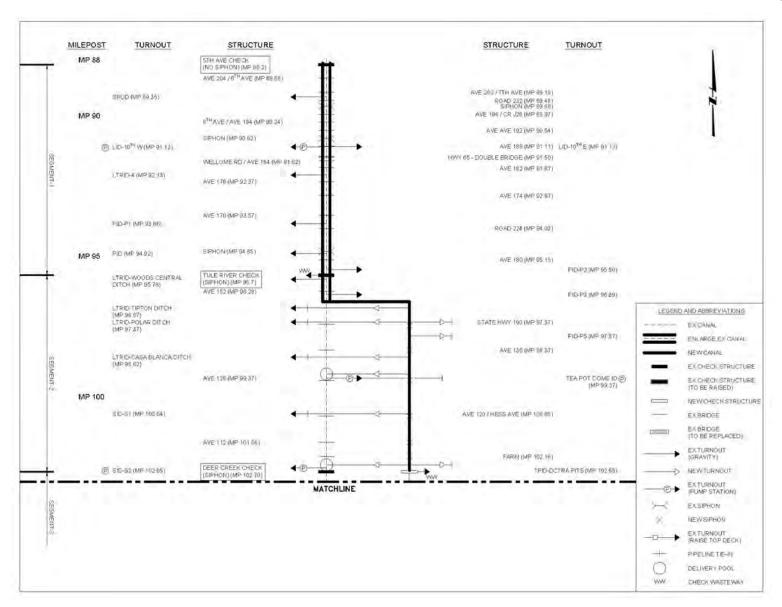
A. Parallel Canal Alternative Single-Line Diagram of Canal Segments 1 and 2
